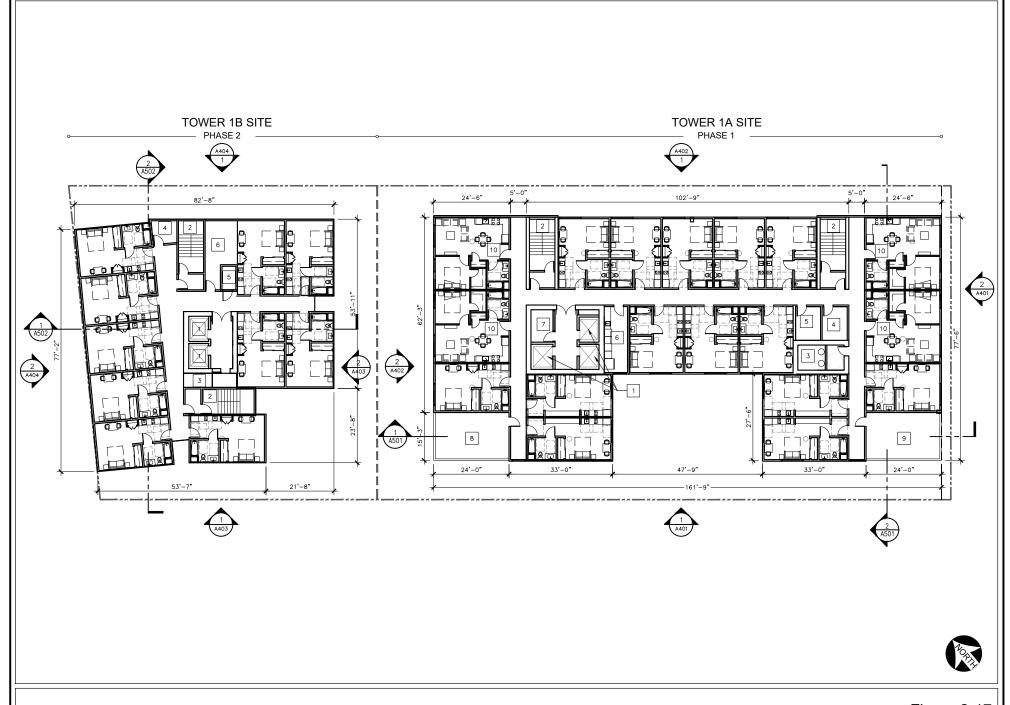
Level 6 and 7 Floor Plan - Site 1
